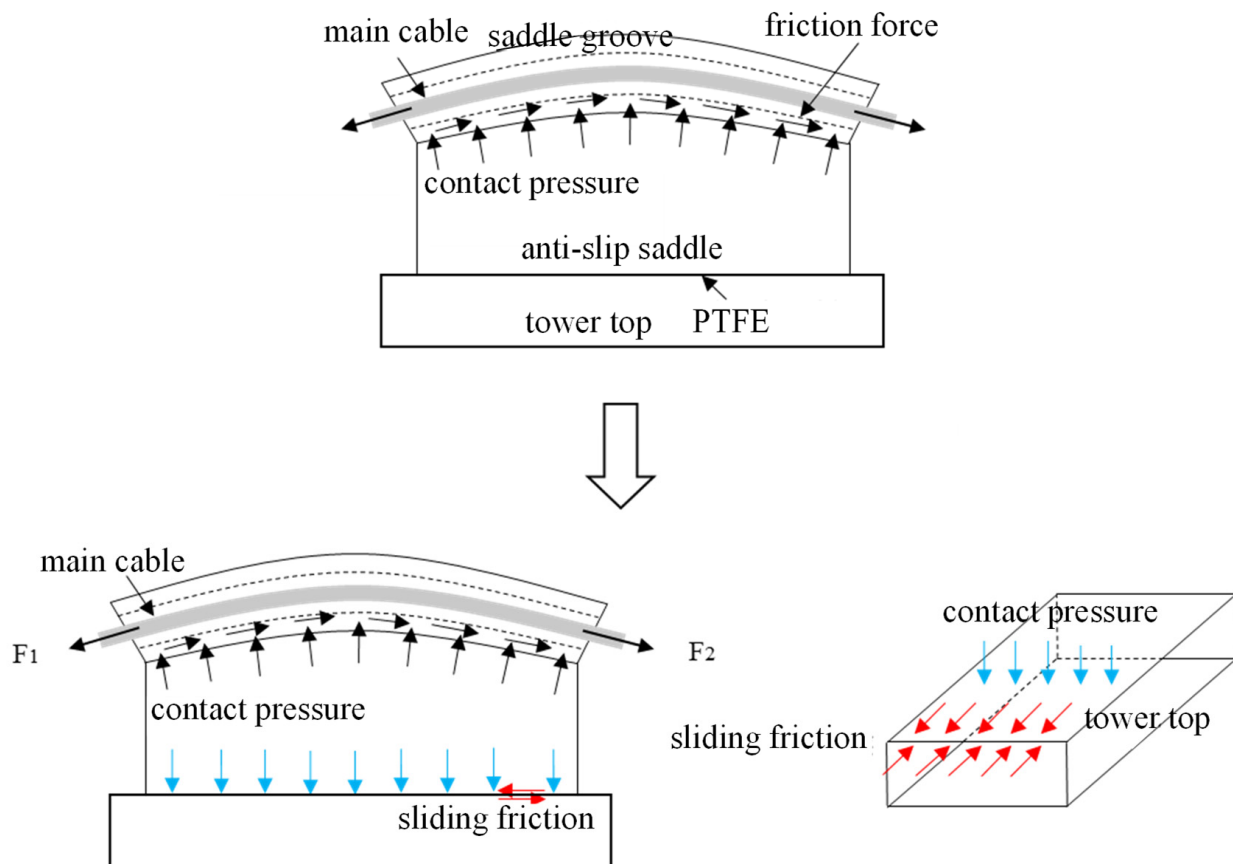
Structural design of a rolling saddle in the center tower of a bridge.
